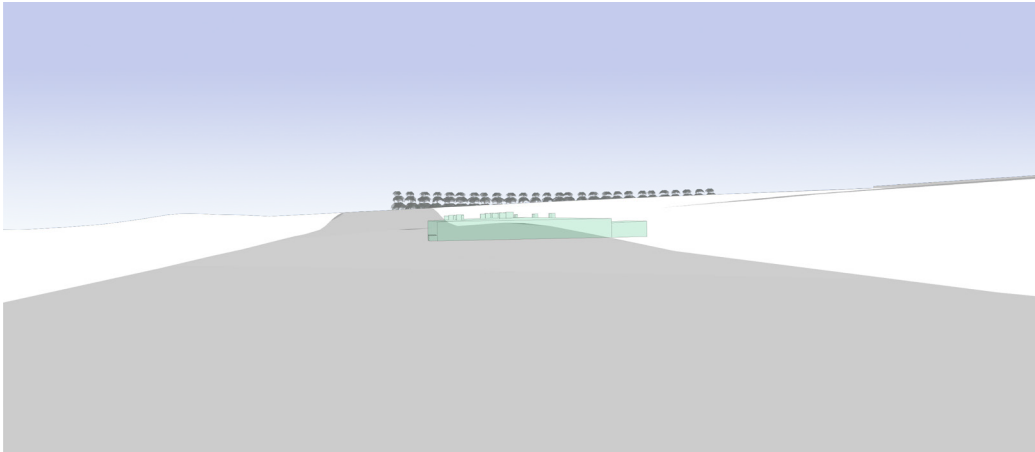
View 03 - Buildings with proposed plant and proposed boundary trees
